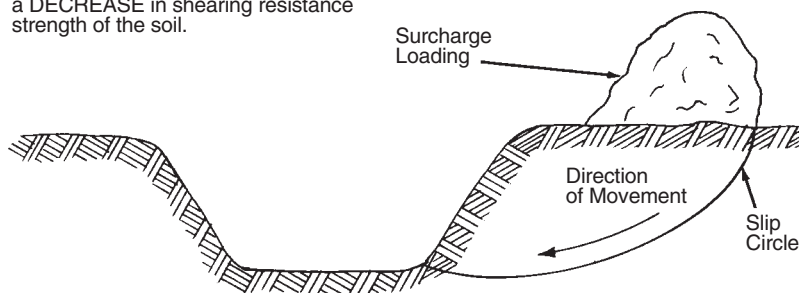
Typical trench wall failure in cohesive soil
